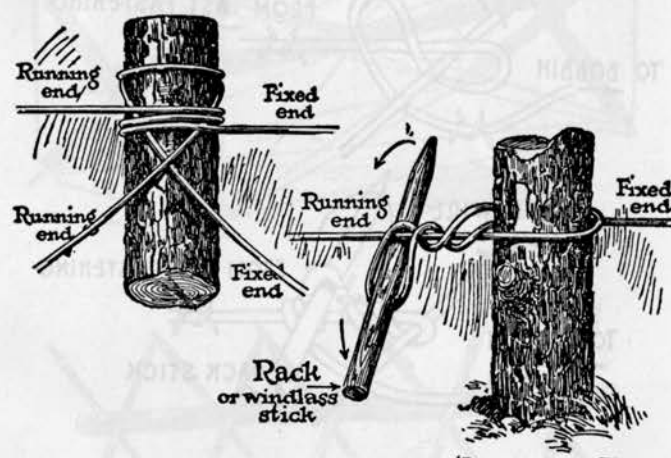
Proper method of fastening wire to wooden pickets.
